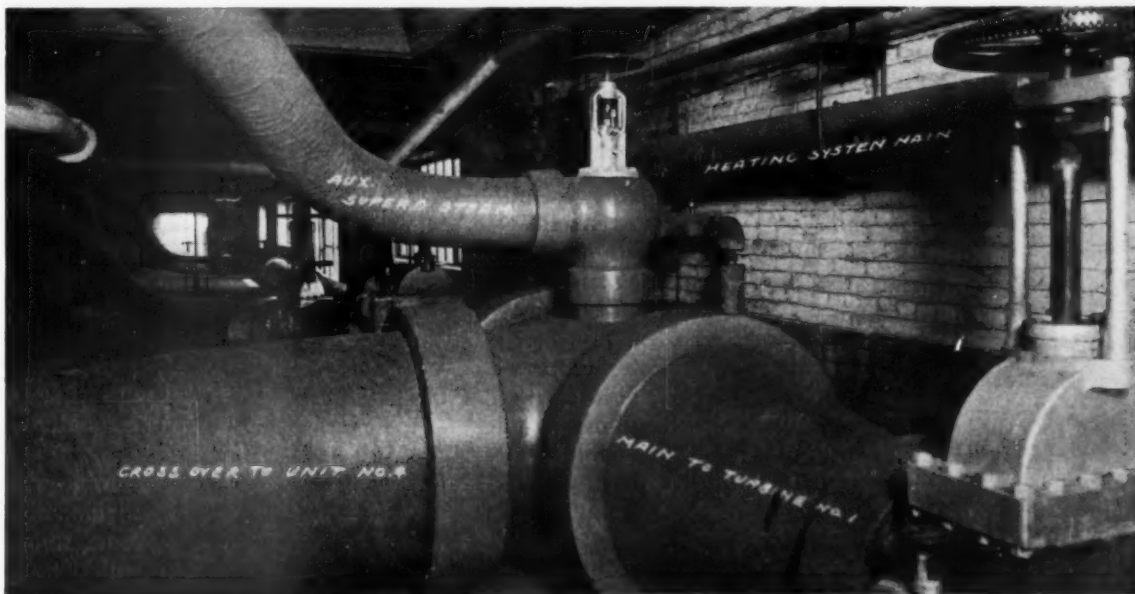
Cast-steel manifold, Old Conners Creek Plant
